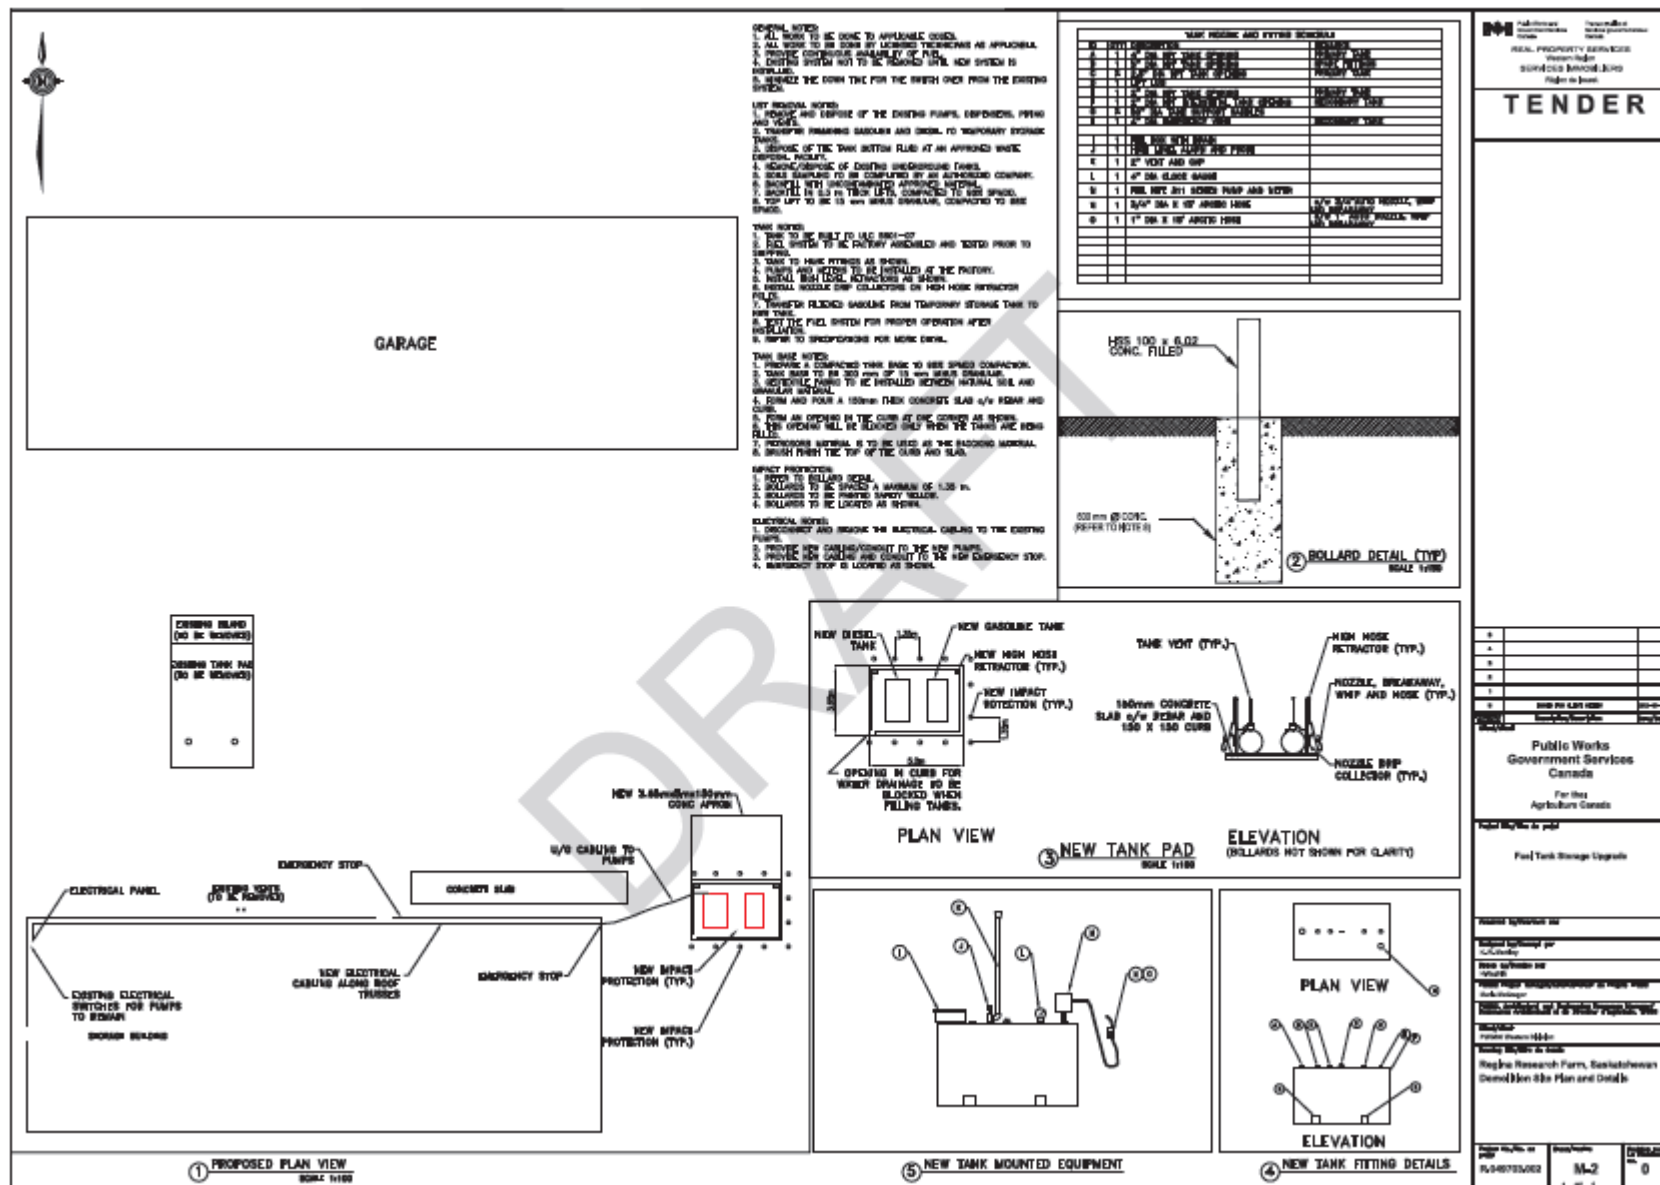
Site plan showing new tank fitting details (PWGSC, 2011).
